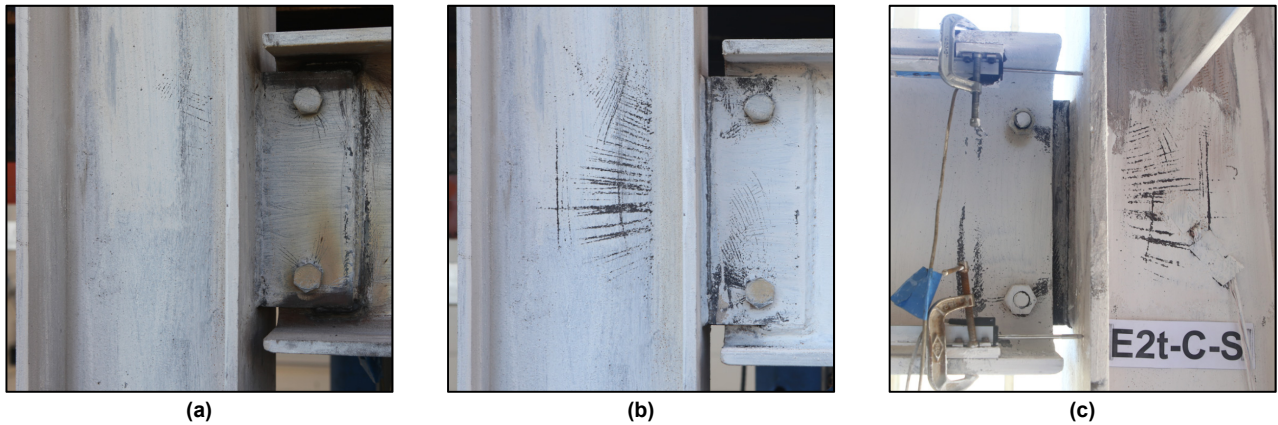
Second-floor east shear tab (welded): (a) additional welds added top and bottom of plate at plate-to-beam interface (part of 2014-10-25 repair); and final damage state of (b) north face and (c) south face.
